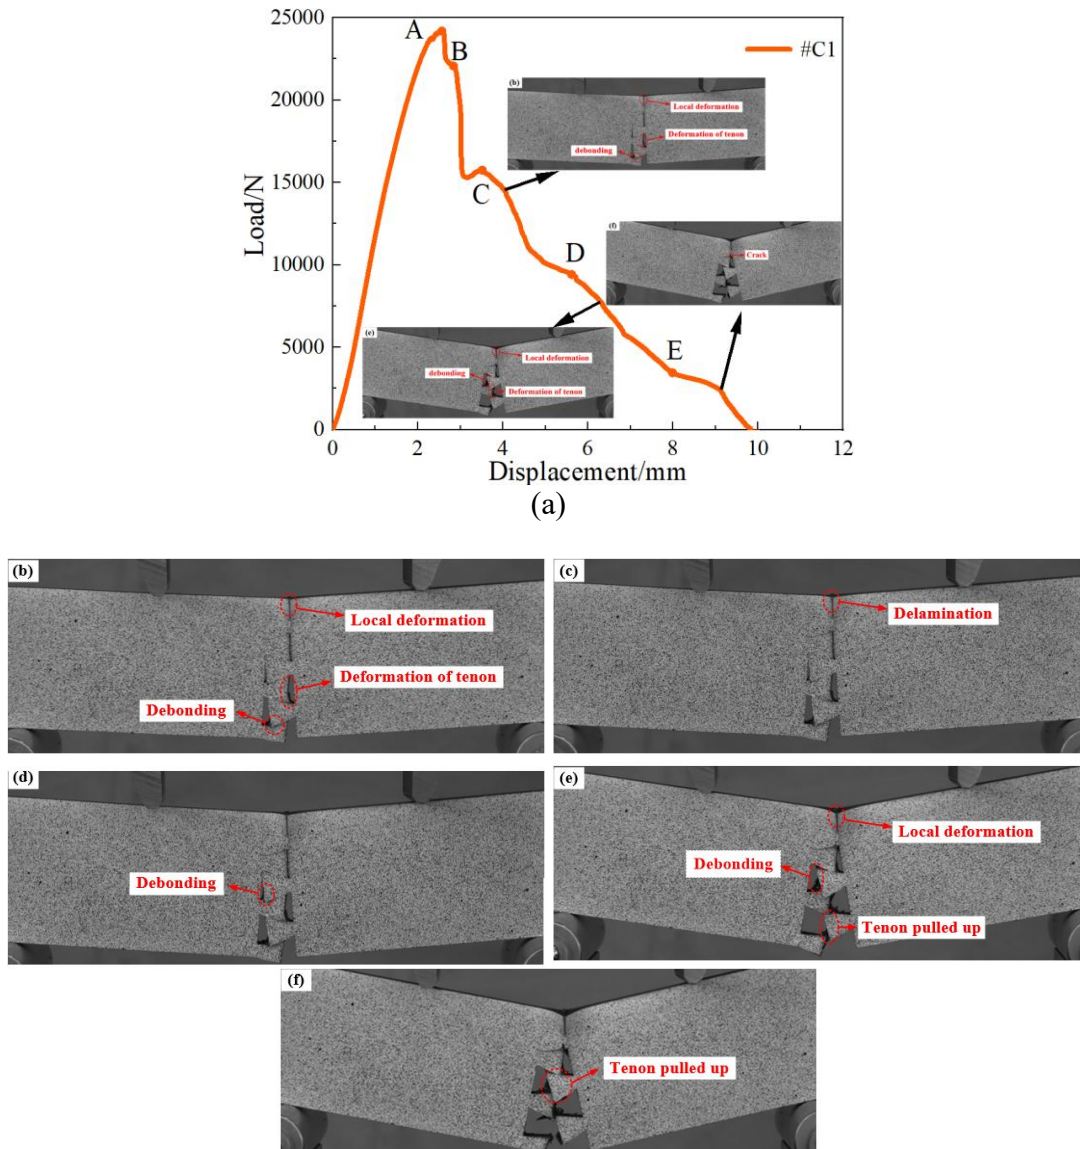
Four-point bending test of specimen #C1 (a) Load displacement curve (b) Structural damage at point A (c) Structural damage at point B (d) Structural damage at point C (e) Structural damage at point D (f) Structural damage at point E
